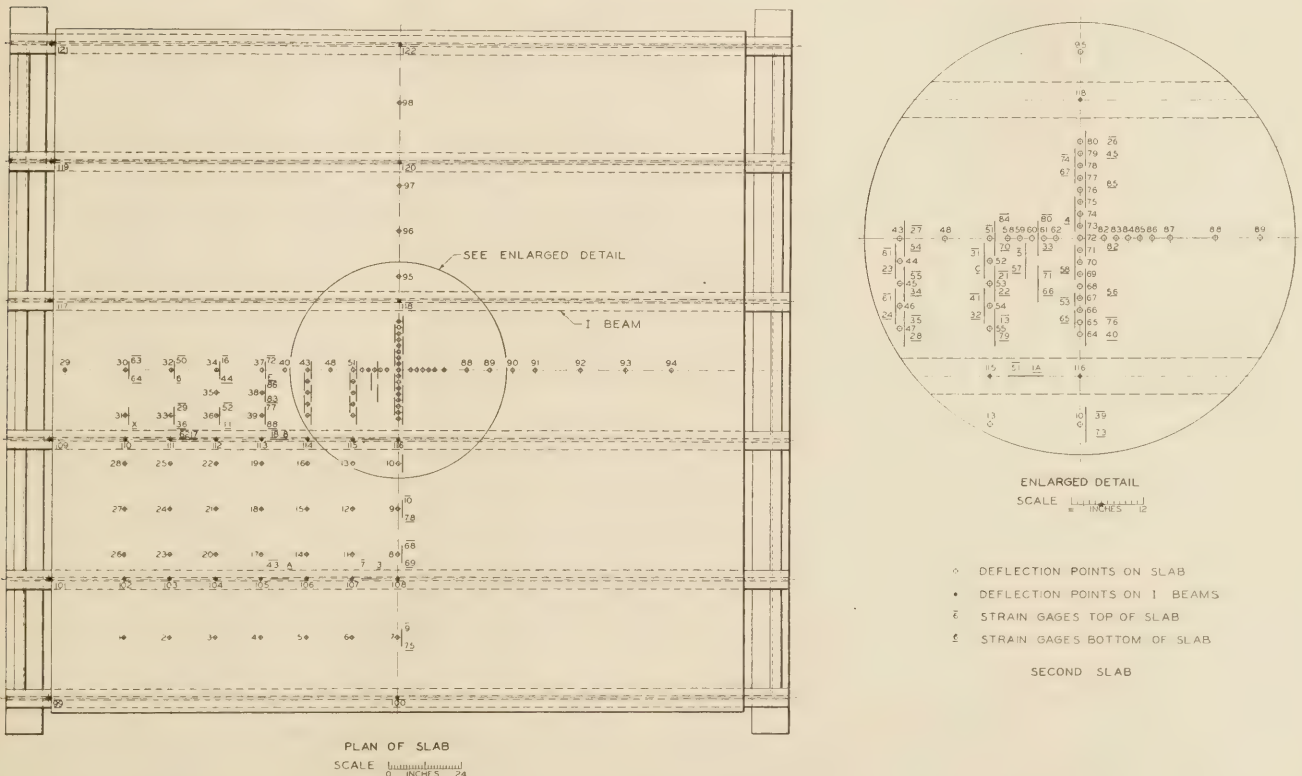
LAYOUT OF DEFLECTION POINTS AND GRAPHIC STRAIN GAUGES FOR SECOND SLAB
